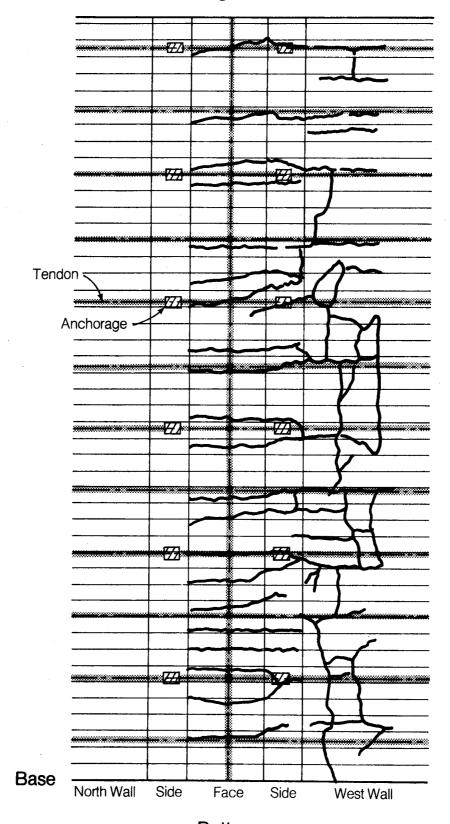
Developed View of West Wall showing Cracks at 130 psi Pressure
